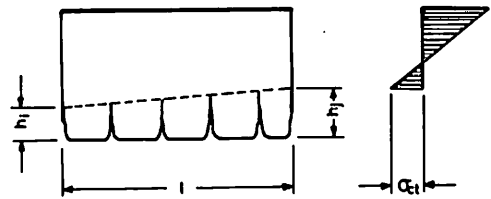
Analytical Model of Crack for Reinforced Concrete Beams
